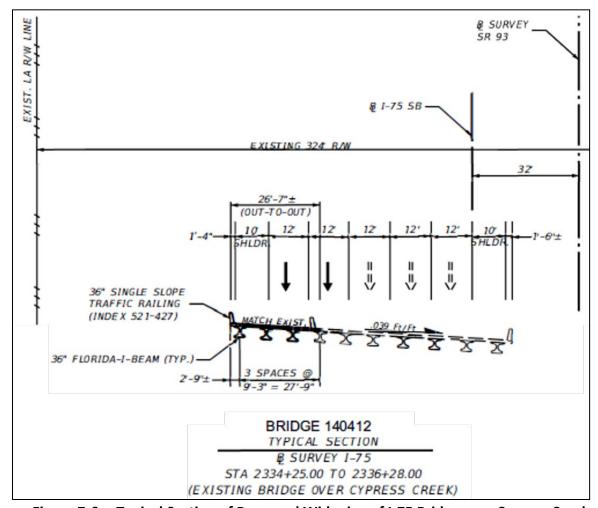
Typical Section of Proposed Widening of I-75 Bridge over Cypress Creek
